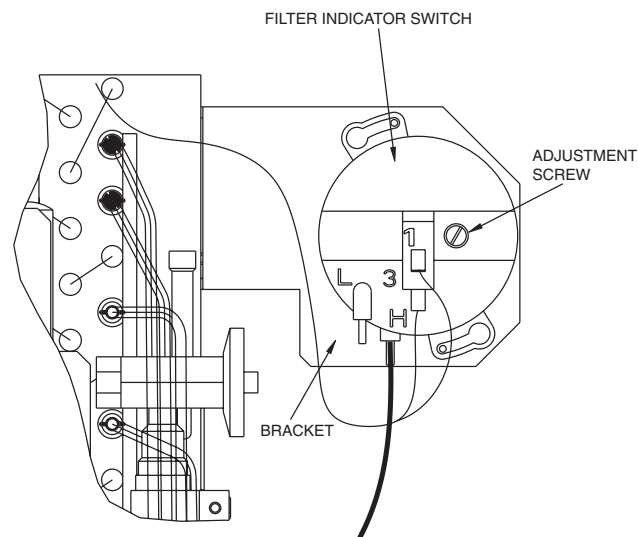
Mounting the Tube Fitting (48/50PG03-16 Units)
